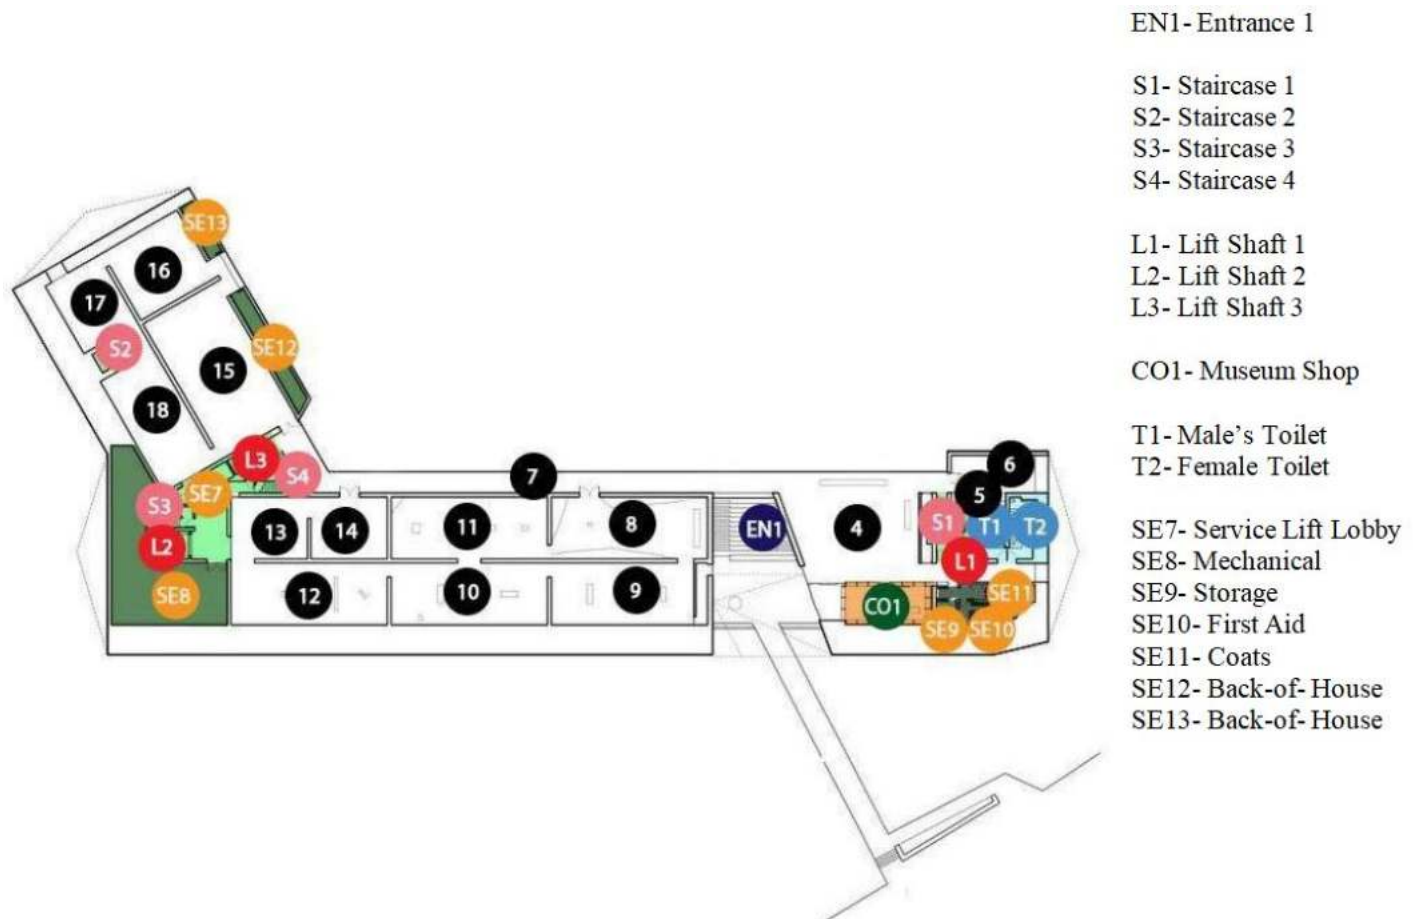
1st Floor Plan Redrawn from source: (Audain Art Museum / Patkau Architects, 2021)
